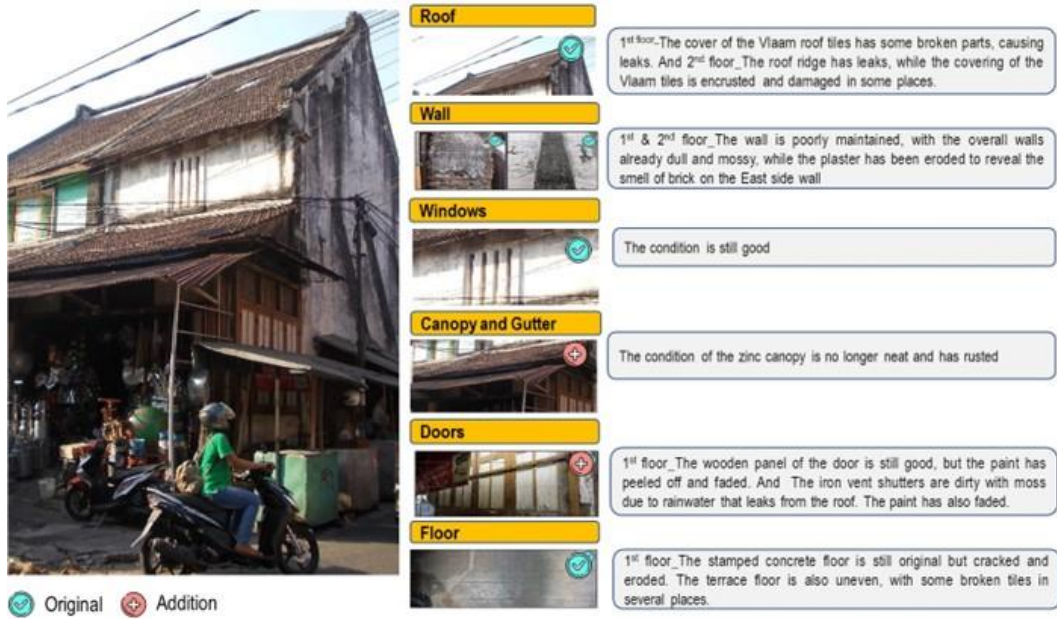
Identification of Facade Damage of the 41 Shop House
